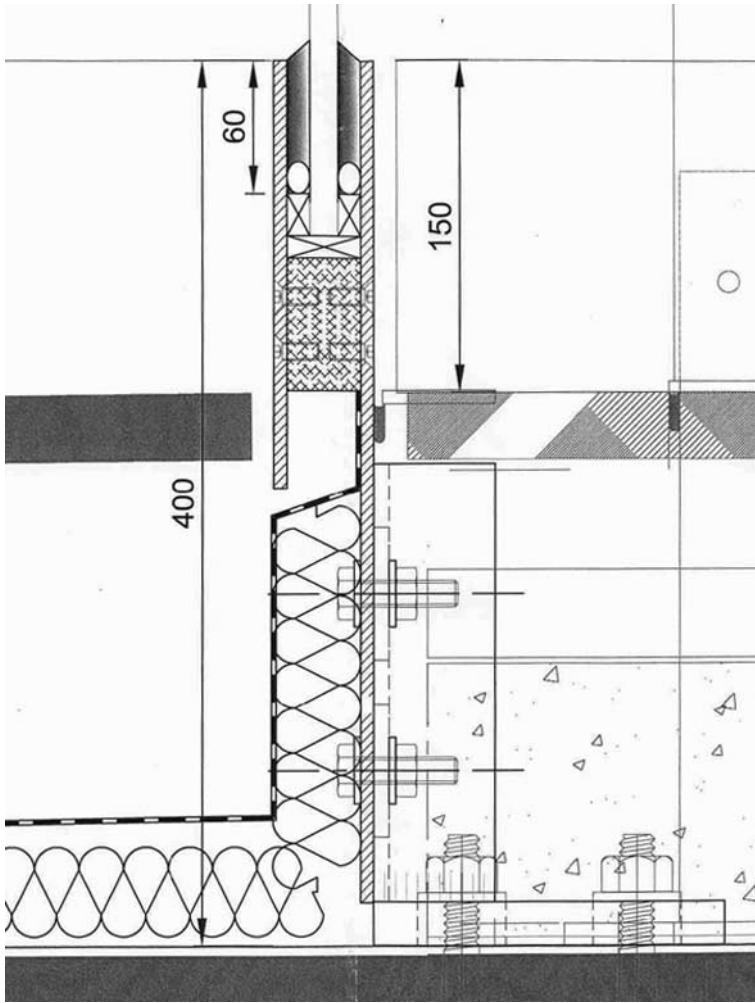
The connecting detail to the floor below the corrugated glass façade of the MAS.
